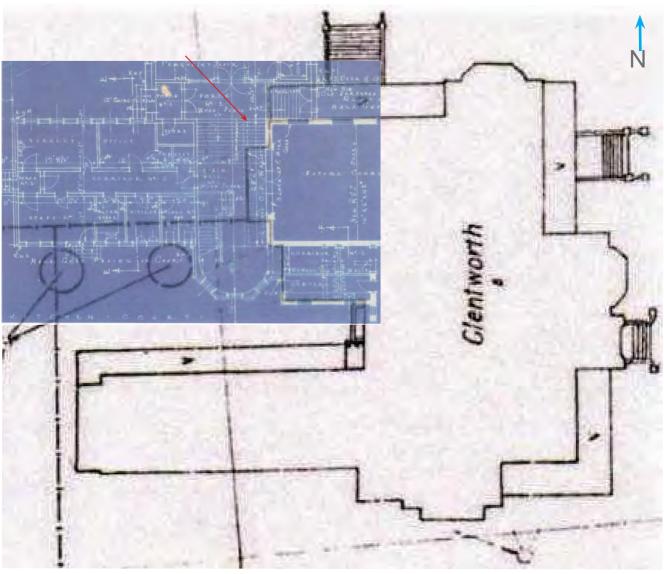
The original footprint of Glentworth House (1886), overlaid with the 1940 blueprint plans for the ground floor of the 'connector building'. This building measuring 40ft by 28ft, was additional to the then convent area. It consisted of two storeys, containing five additional bedrooms and bathroom accommodation on the first floor, as well as and offices and a surgery on the ground floor. It is at this intersection point between the major buildings that there are substantial level changes on each of the floors. Note the position of the original bay window off the ballroom and the new relationship to the upper verandah space (Source: Overlay 1886 Water board plan overlaid with 1940 Glancey blueprint (Ashfield Council archives)
